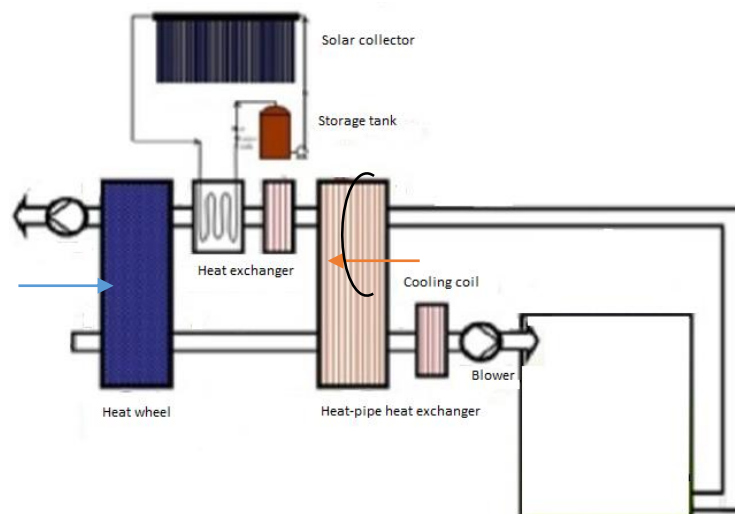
A proposed schematic drawing to upgrade the HVAC system embedded with a hybrid system to Building 11 at the University of Technology, Sydney. *UTS Building 11.
